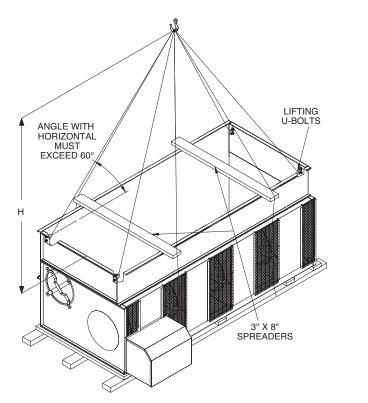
Pan/Fan Section (24' and 36' Long - 6 lift points shown)
